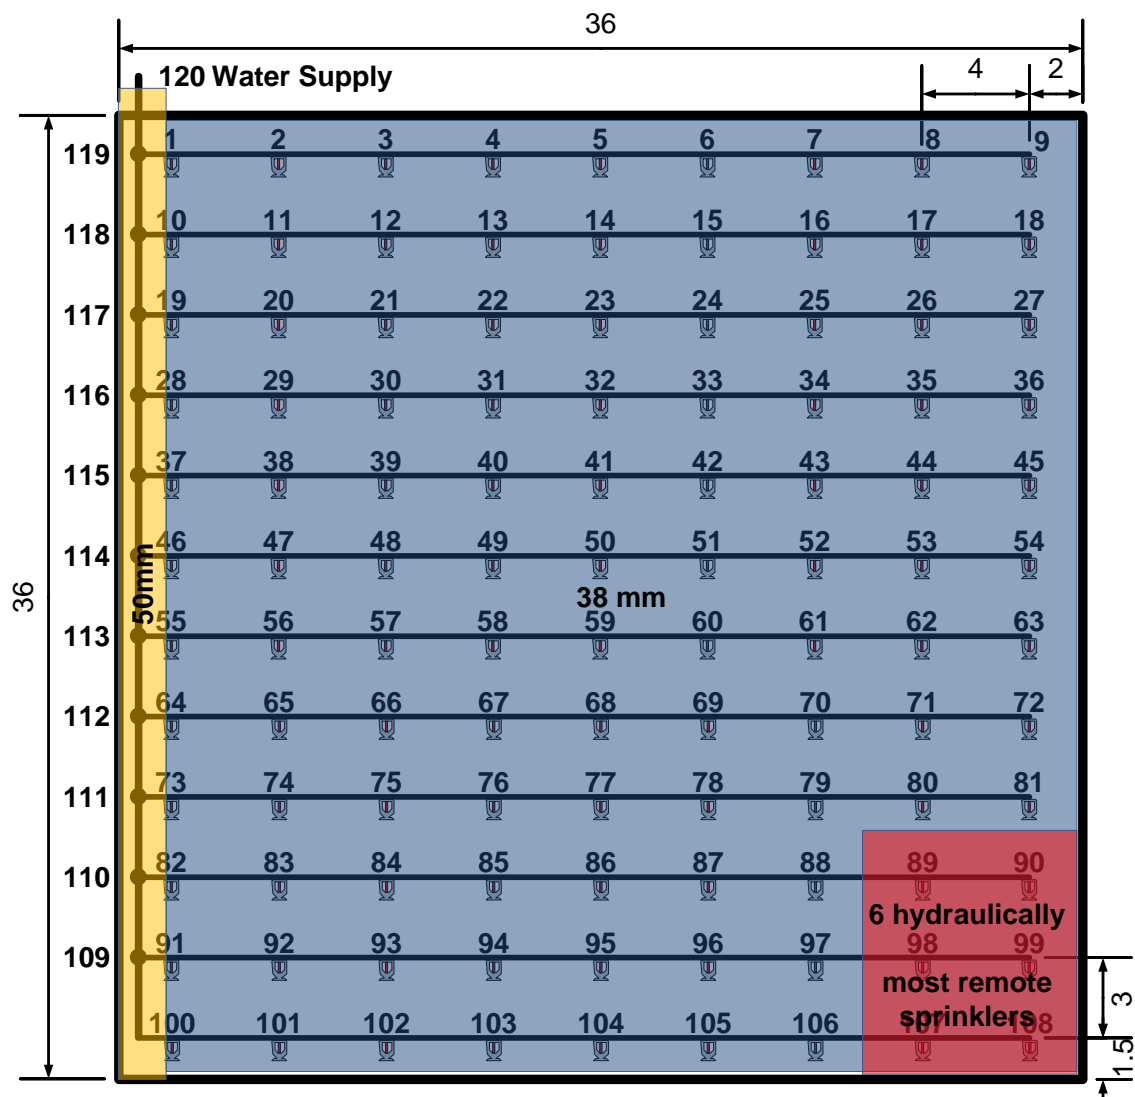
OH sprinkler layout for one floor of the 140 William Street building. Nodes used for the hydraulic model are shown. Dimensions shown in m, except for nominal pipe diameters shown in mm.
